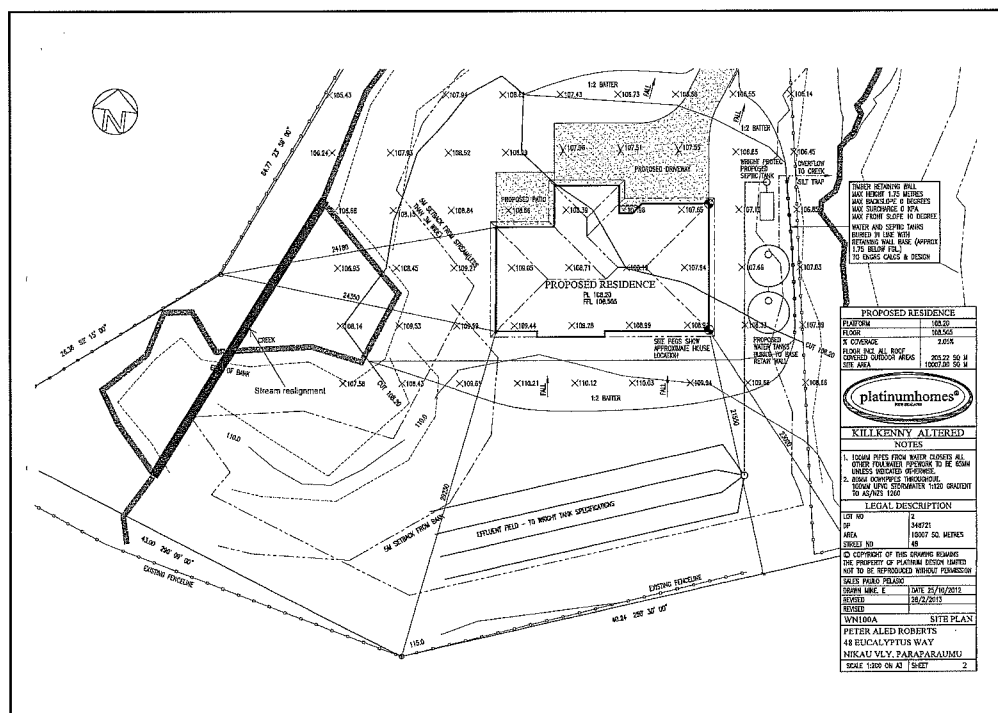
Locality Plan showing location of proposed building platform and stream realignment
